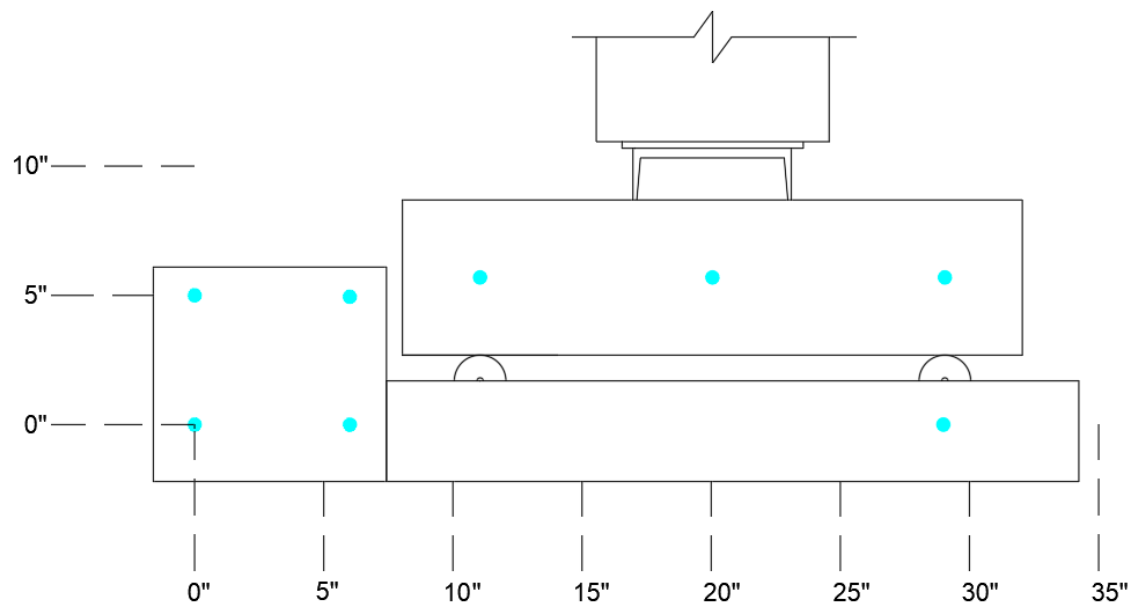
Optotrak Target Layout in E_w Beam Tests
